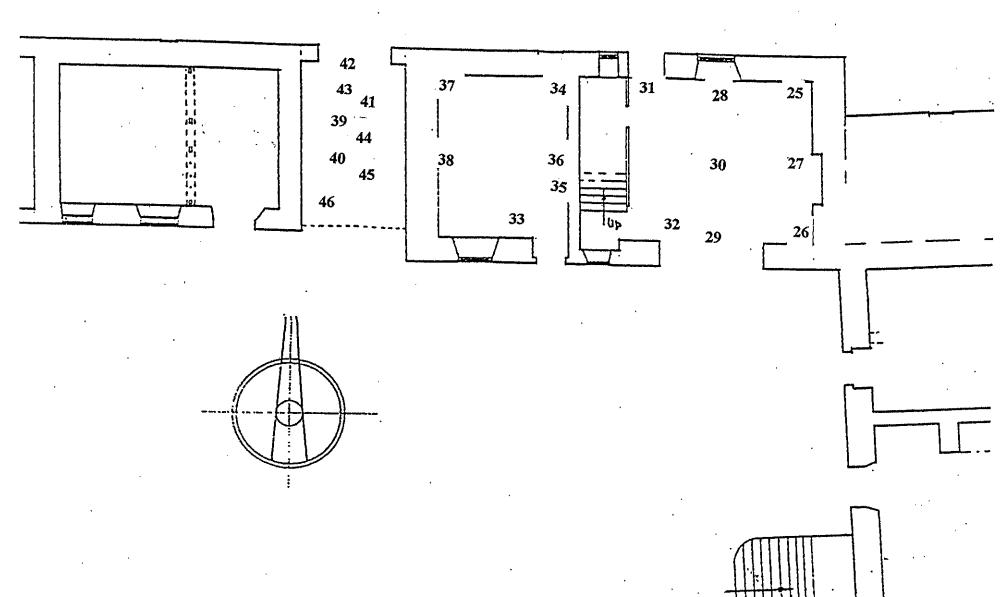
Plan to show approximate location of sampled timbers from the North range (east end) and the carriageway
